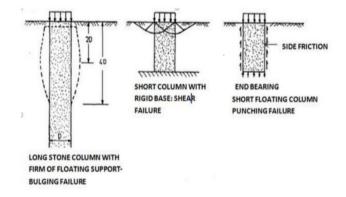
Type of failure of stone column subjected to compressive load (IS: 15284-2003) [1]
